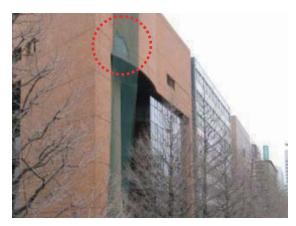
Detachment of ceramic wall tiles from RC wall
